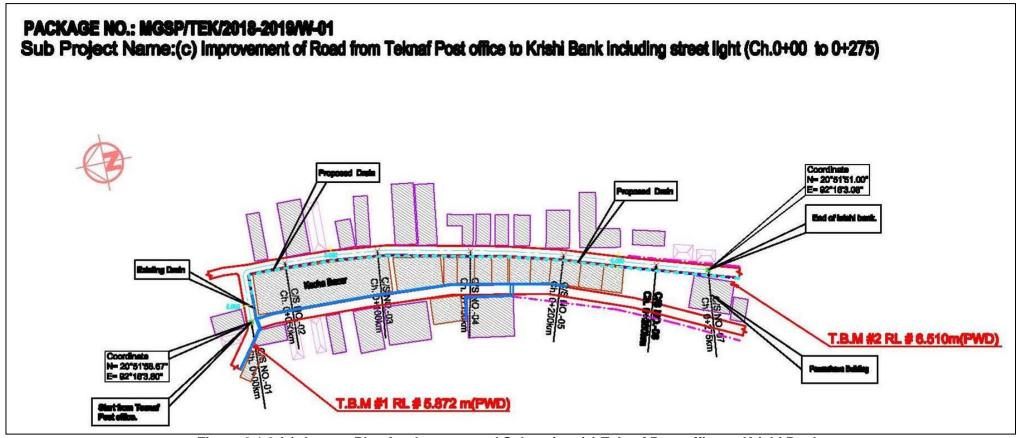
(c): Layout Plan for the proposed Subproject (c) Teknaf Post office to Krishi Bank
